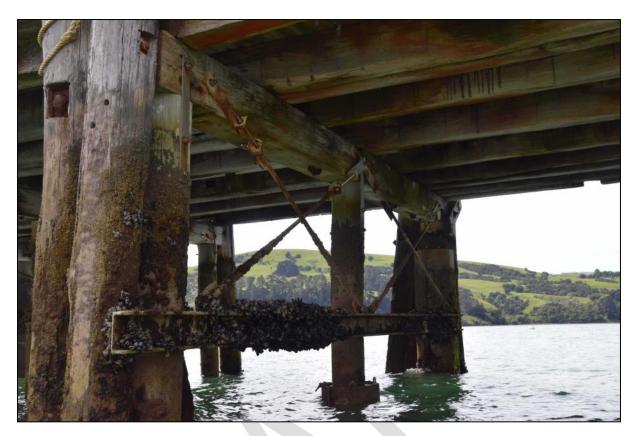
An example of modern steel repairs – bolted straps between the piles and cap beam, a steel PFC horizontal tie and double steel bracing rods. There is also an earlier steel jacket repair to the central pile.
